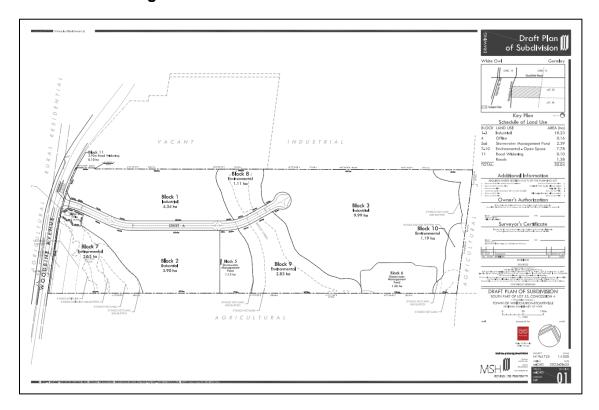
is a copy of the revised draft plan of subdivision, and Figure 4 is a copy of the redline revisions displayed against the previously approved draft plan.
